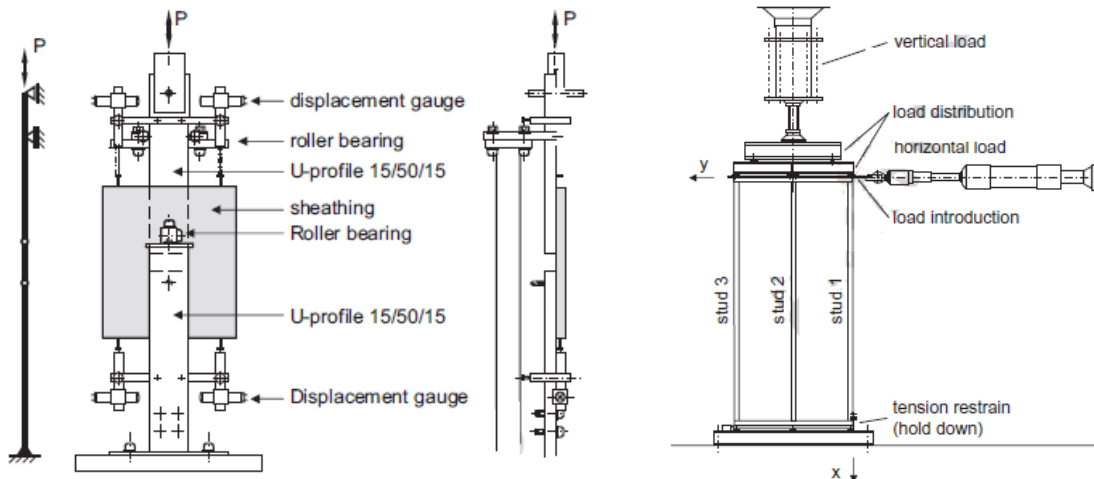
Schematic of laboratory equipment for loading on CFS shear wall under horizontal and vertical load in the research of Langea and Naujoks [9]
